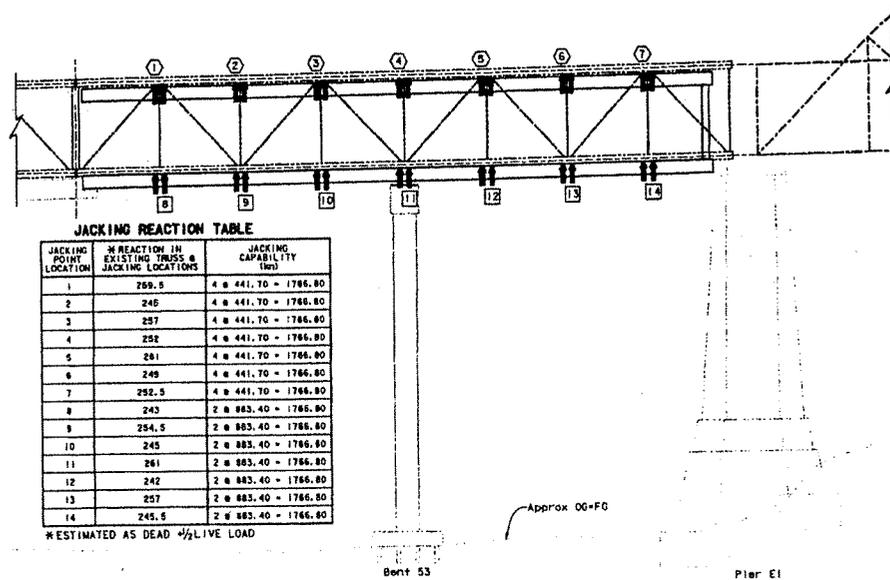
b: Load Transfer of South Segment Stage 2, Elevation View
